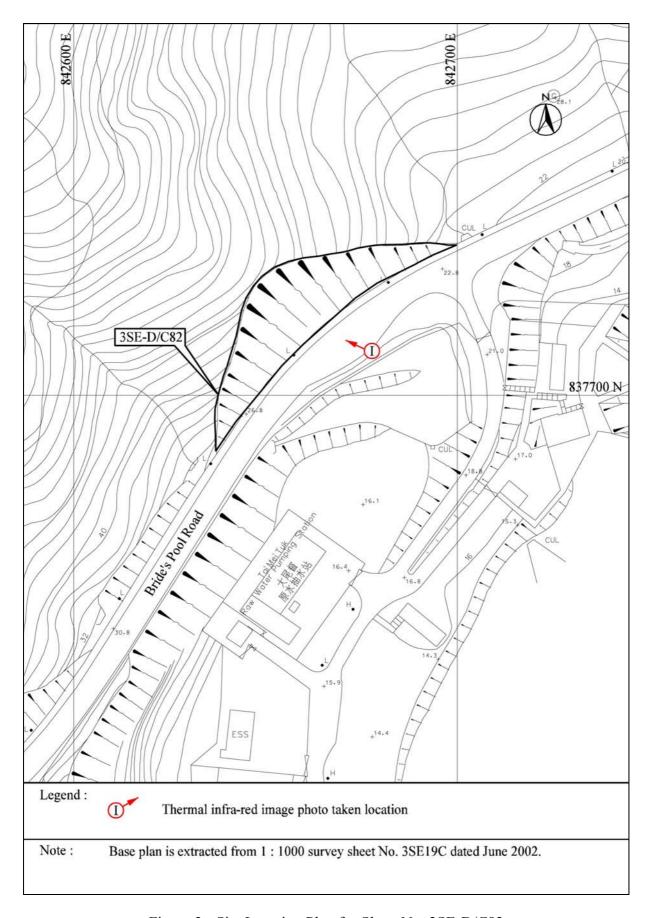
Site Location Plan for Slope No. 3SE-D/C82
